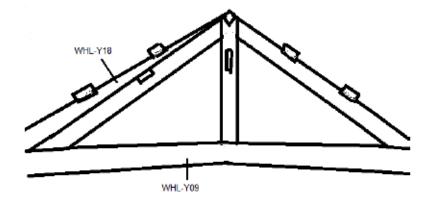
Sketch of truss 4, showing the location of samples WHL-Y09 and WHL-Y18
